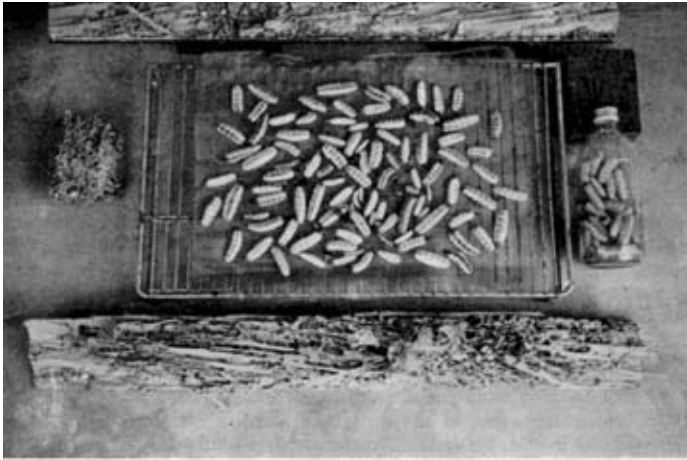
A collection of white ant queens and examples of damaged timber. One queen can produce enough "workers" to destroy a whole building.
